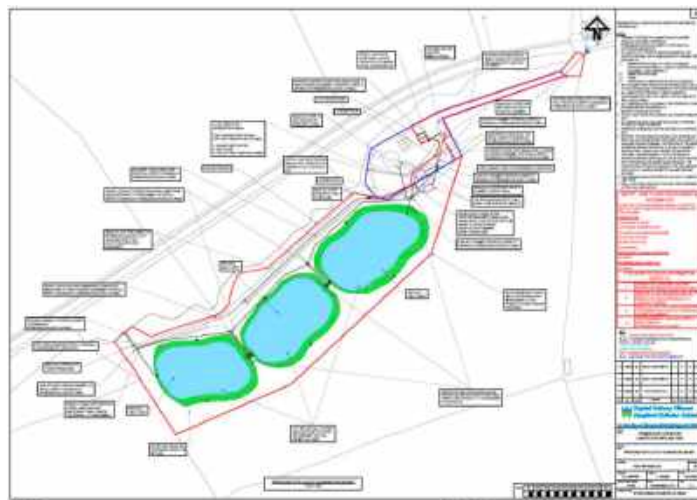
The Proposed site layout (Refer to Figure 2 of the Appendices)
